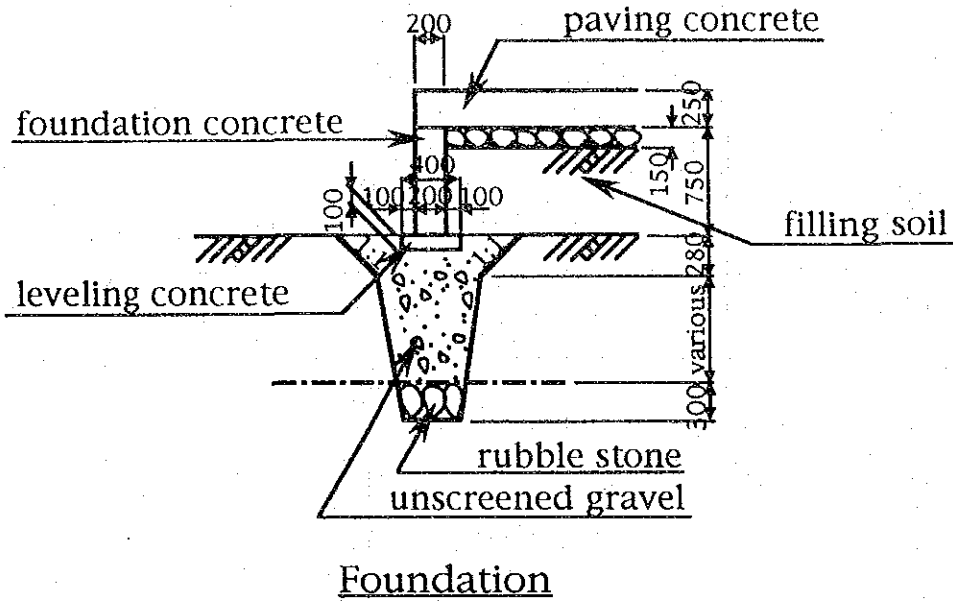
Foundation and Concrete Pavement for Container Platform
